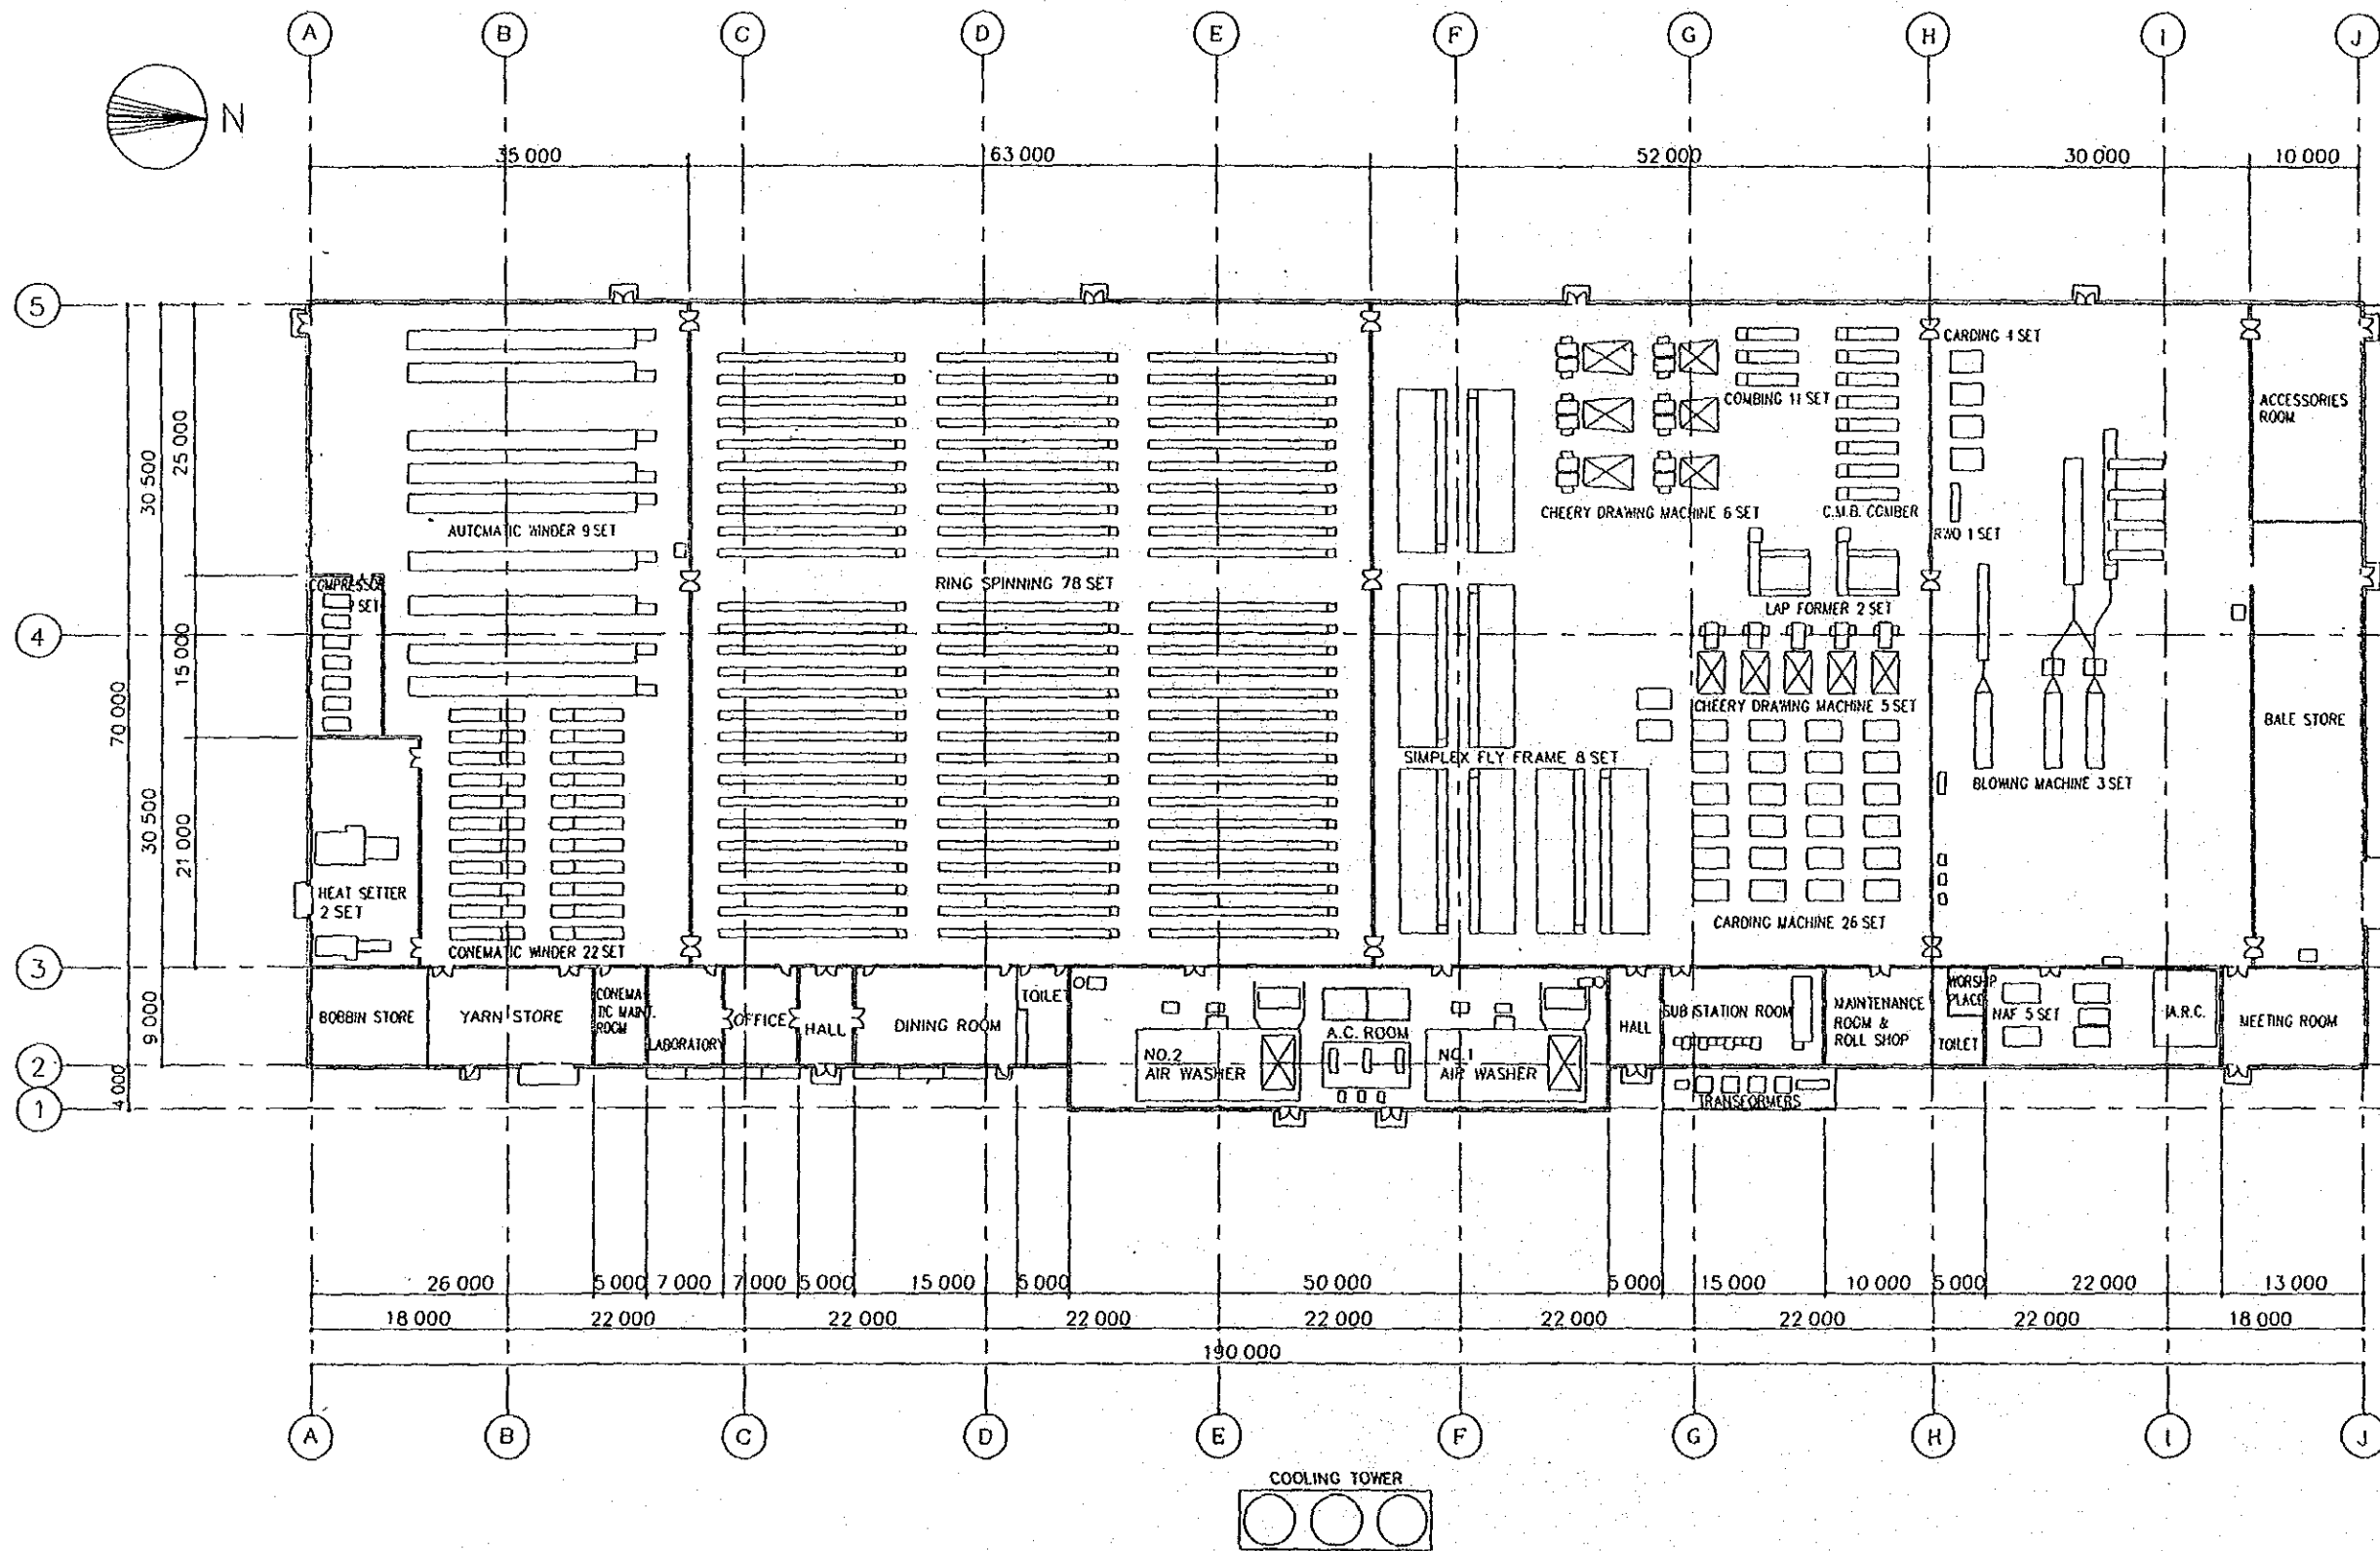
Layout of Production Machinery : Banjaran Second Mill
